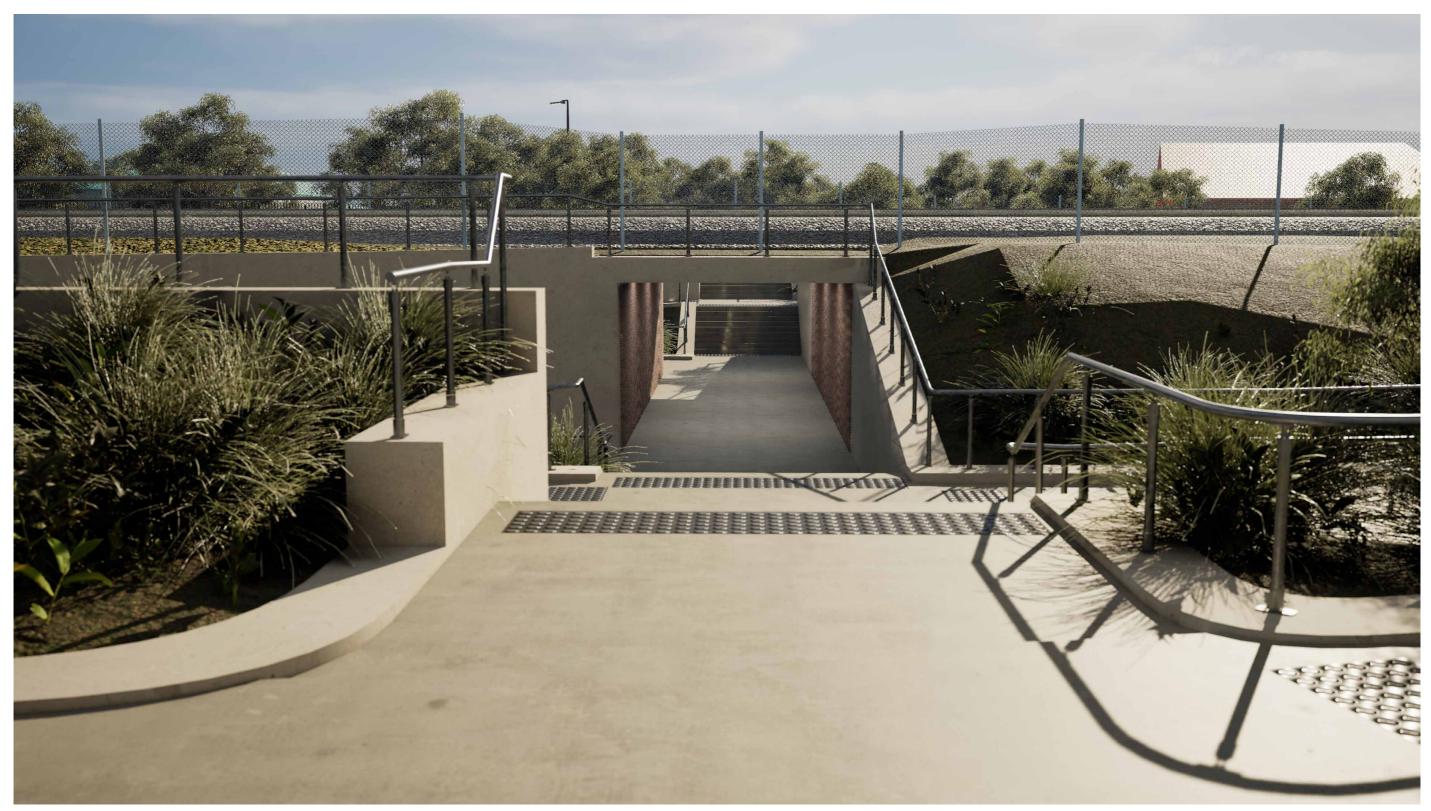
Indicative artistic impression of the upgraded Euroa Station and new Anderson Street road underpass, looking east.
